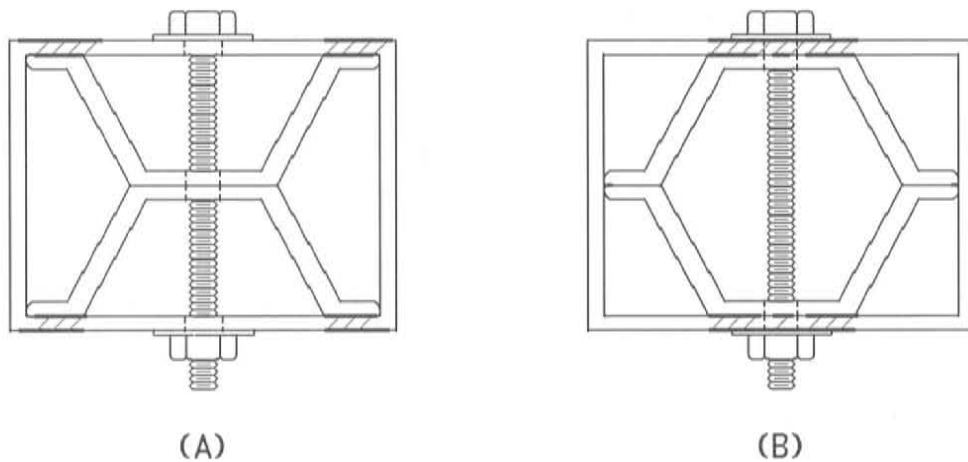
END VIEW OF (A) BACK TO BACK AND (B) FACE TO FACE BOX SECTION SPLICES ILLUSTRATING CHANNEL LOADS.
